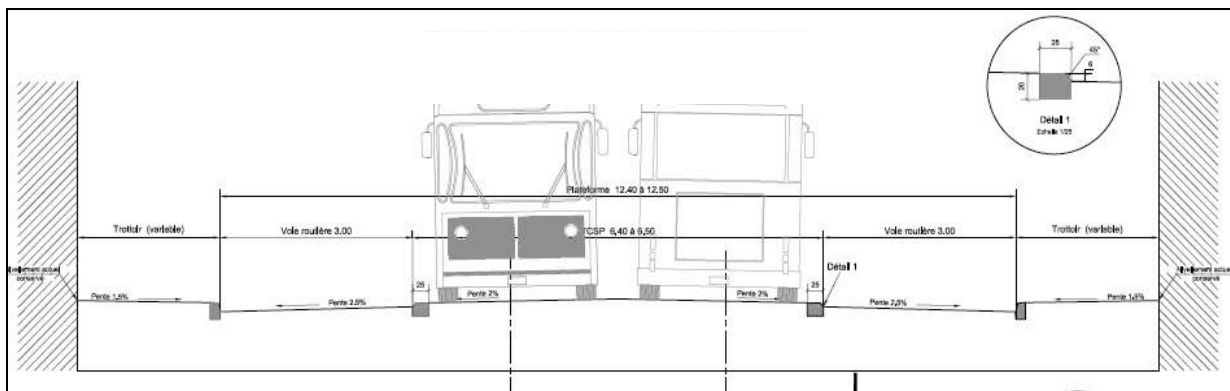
Section type n°4 the transit right of way and a two-way road
